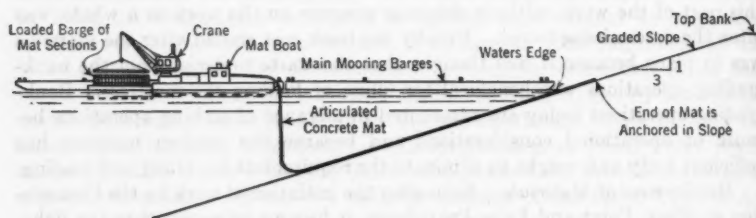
PLACEMENT OF ARTICULATED CONCRETE MATTRESS
